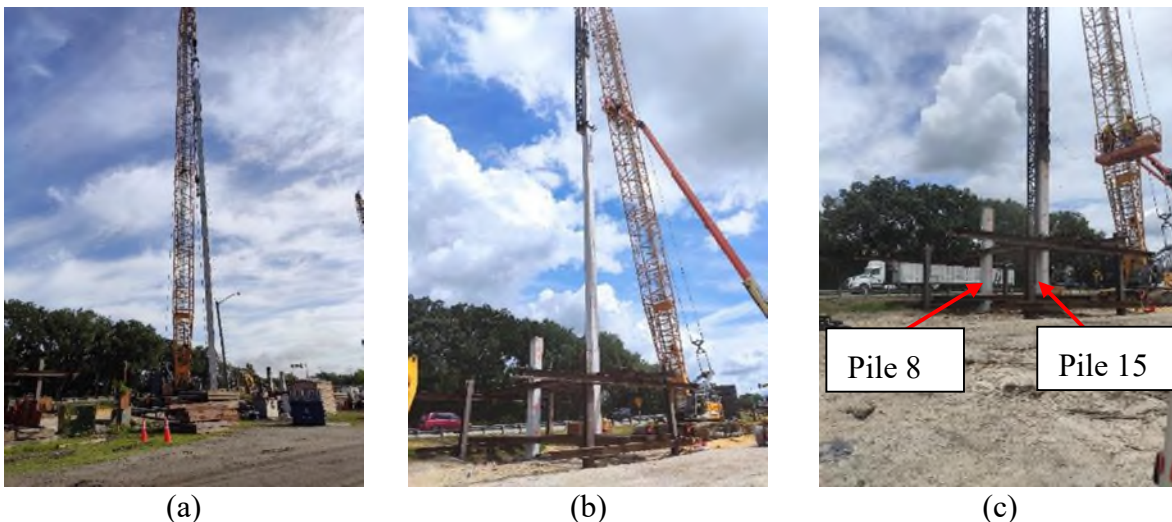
Driving process of pile 15 at Site A2: (a) pile hoisting, (b) hammer in leads, and (c) hammer impact acting on the pile.
